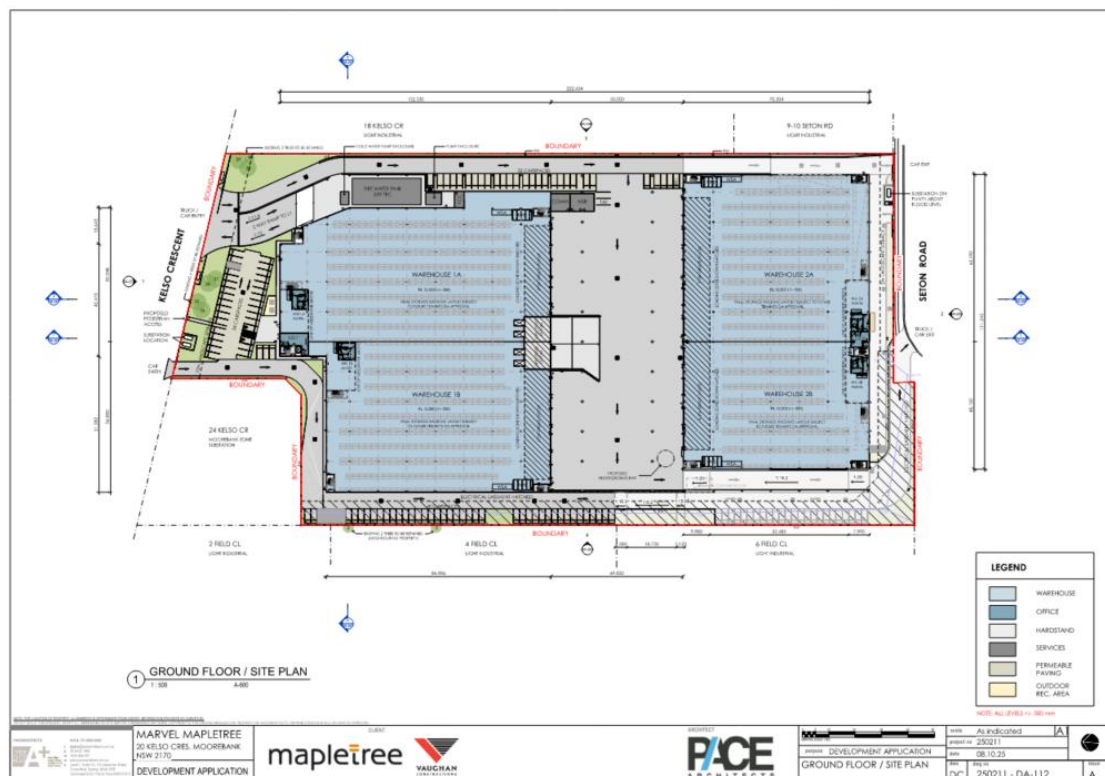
Proposed Development – Site Plan (Source: Pace Architects)
